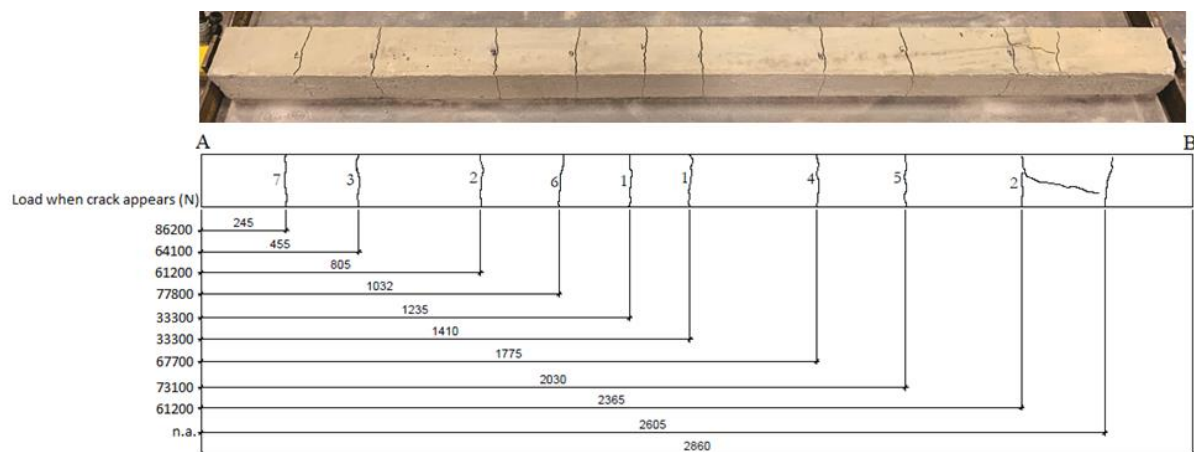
Prism test and crack pattern: #6 rGFRP – specimen 2.
